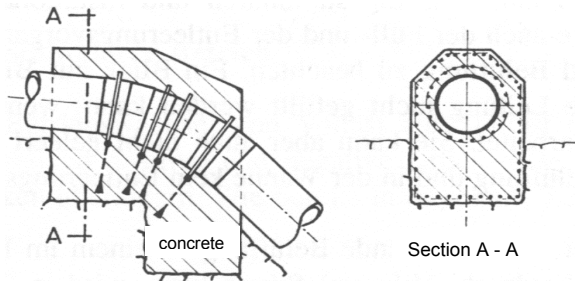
One typical solution for an anchor block of a penstock [1]
